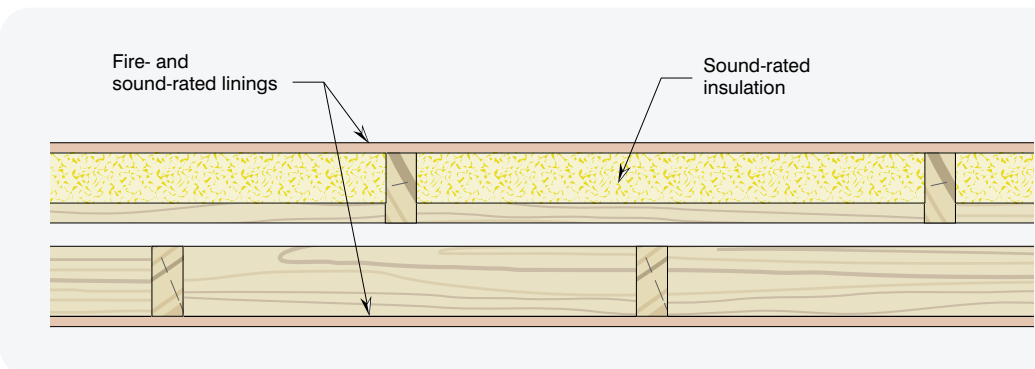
Fire- and sound-rated double stud separating wall systems – plan view.
